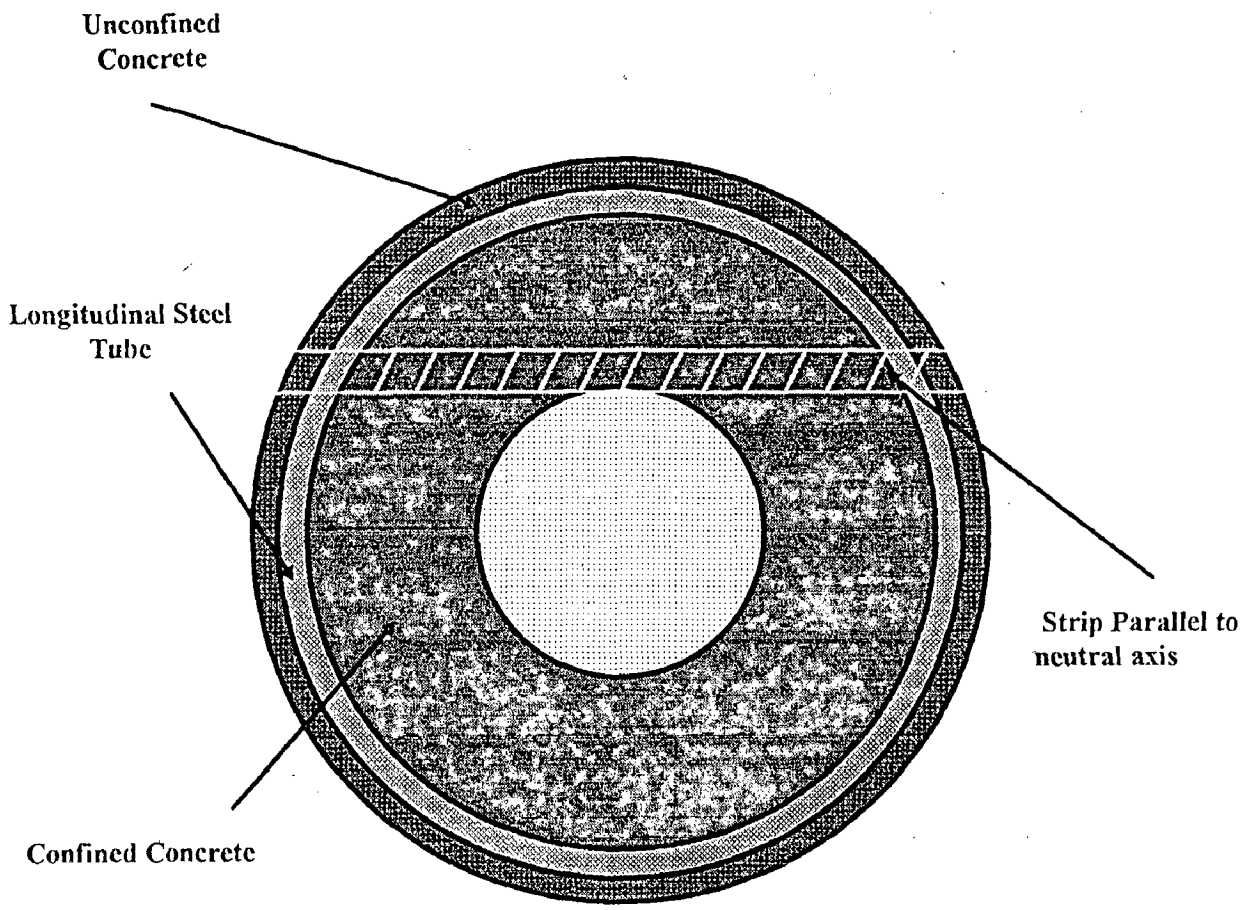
Cross-sectional shape of Hollow Circular Column Section, Longitudinal reinforcement is replaced with a equivalent tube of steel
